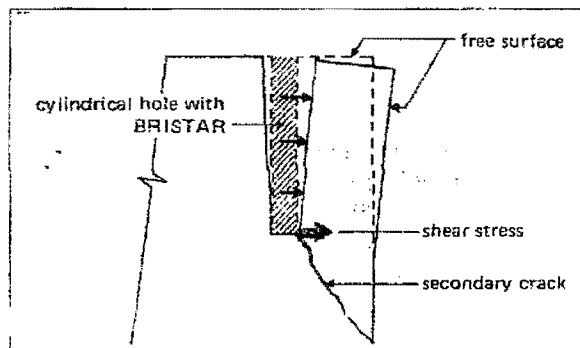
Sectional-view of the crack formation in the material with two free surfaces
